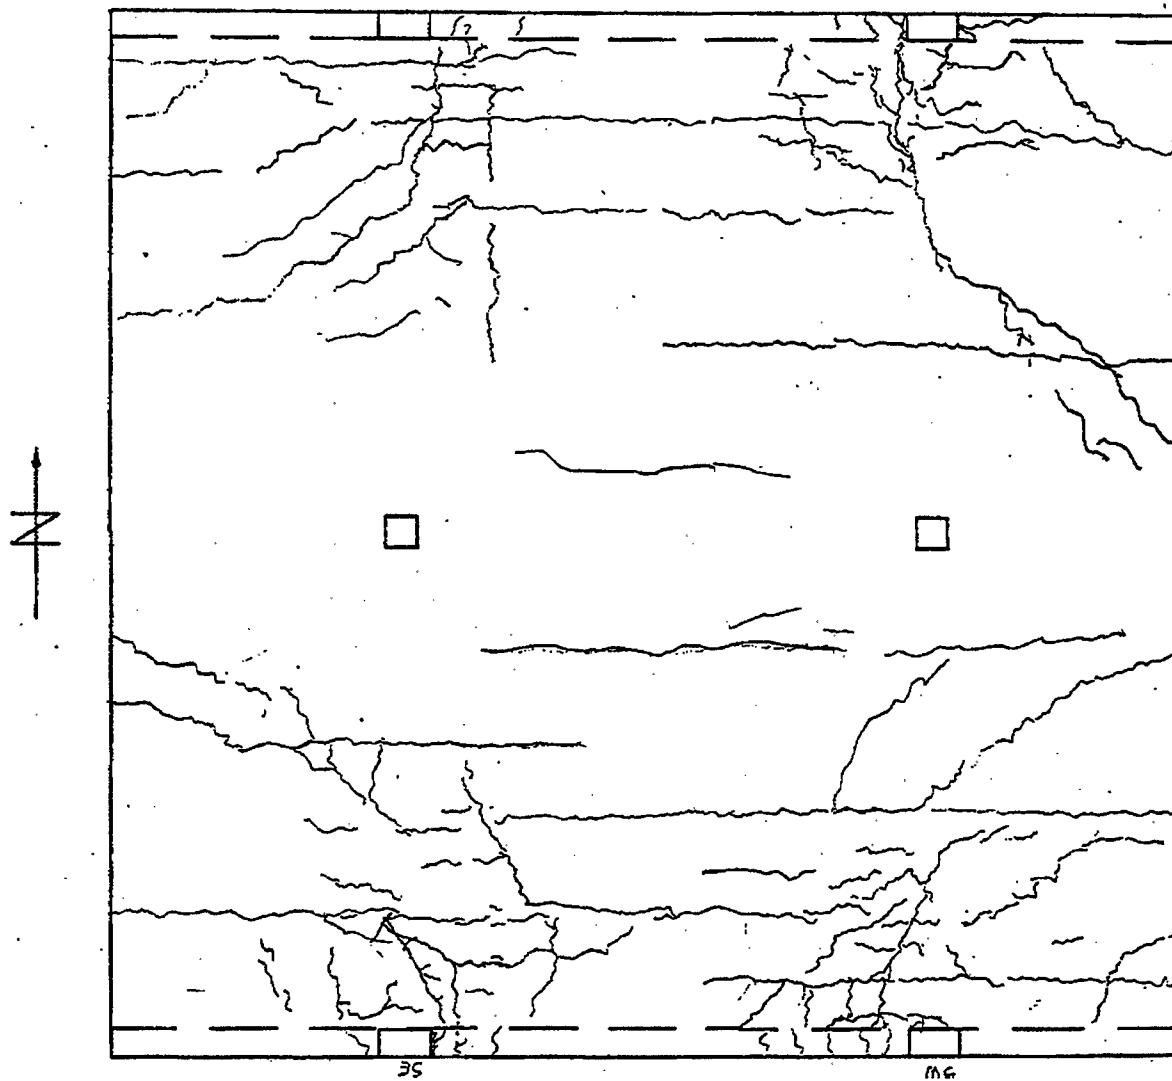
Crack Pattern, Second Floor Slab, Bottom Side, Post-T420DL
